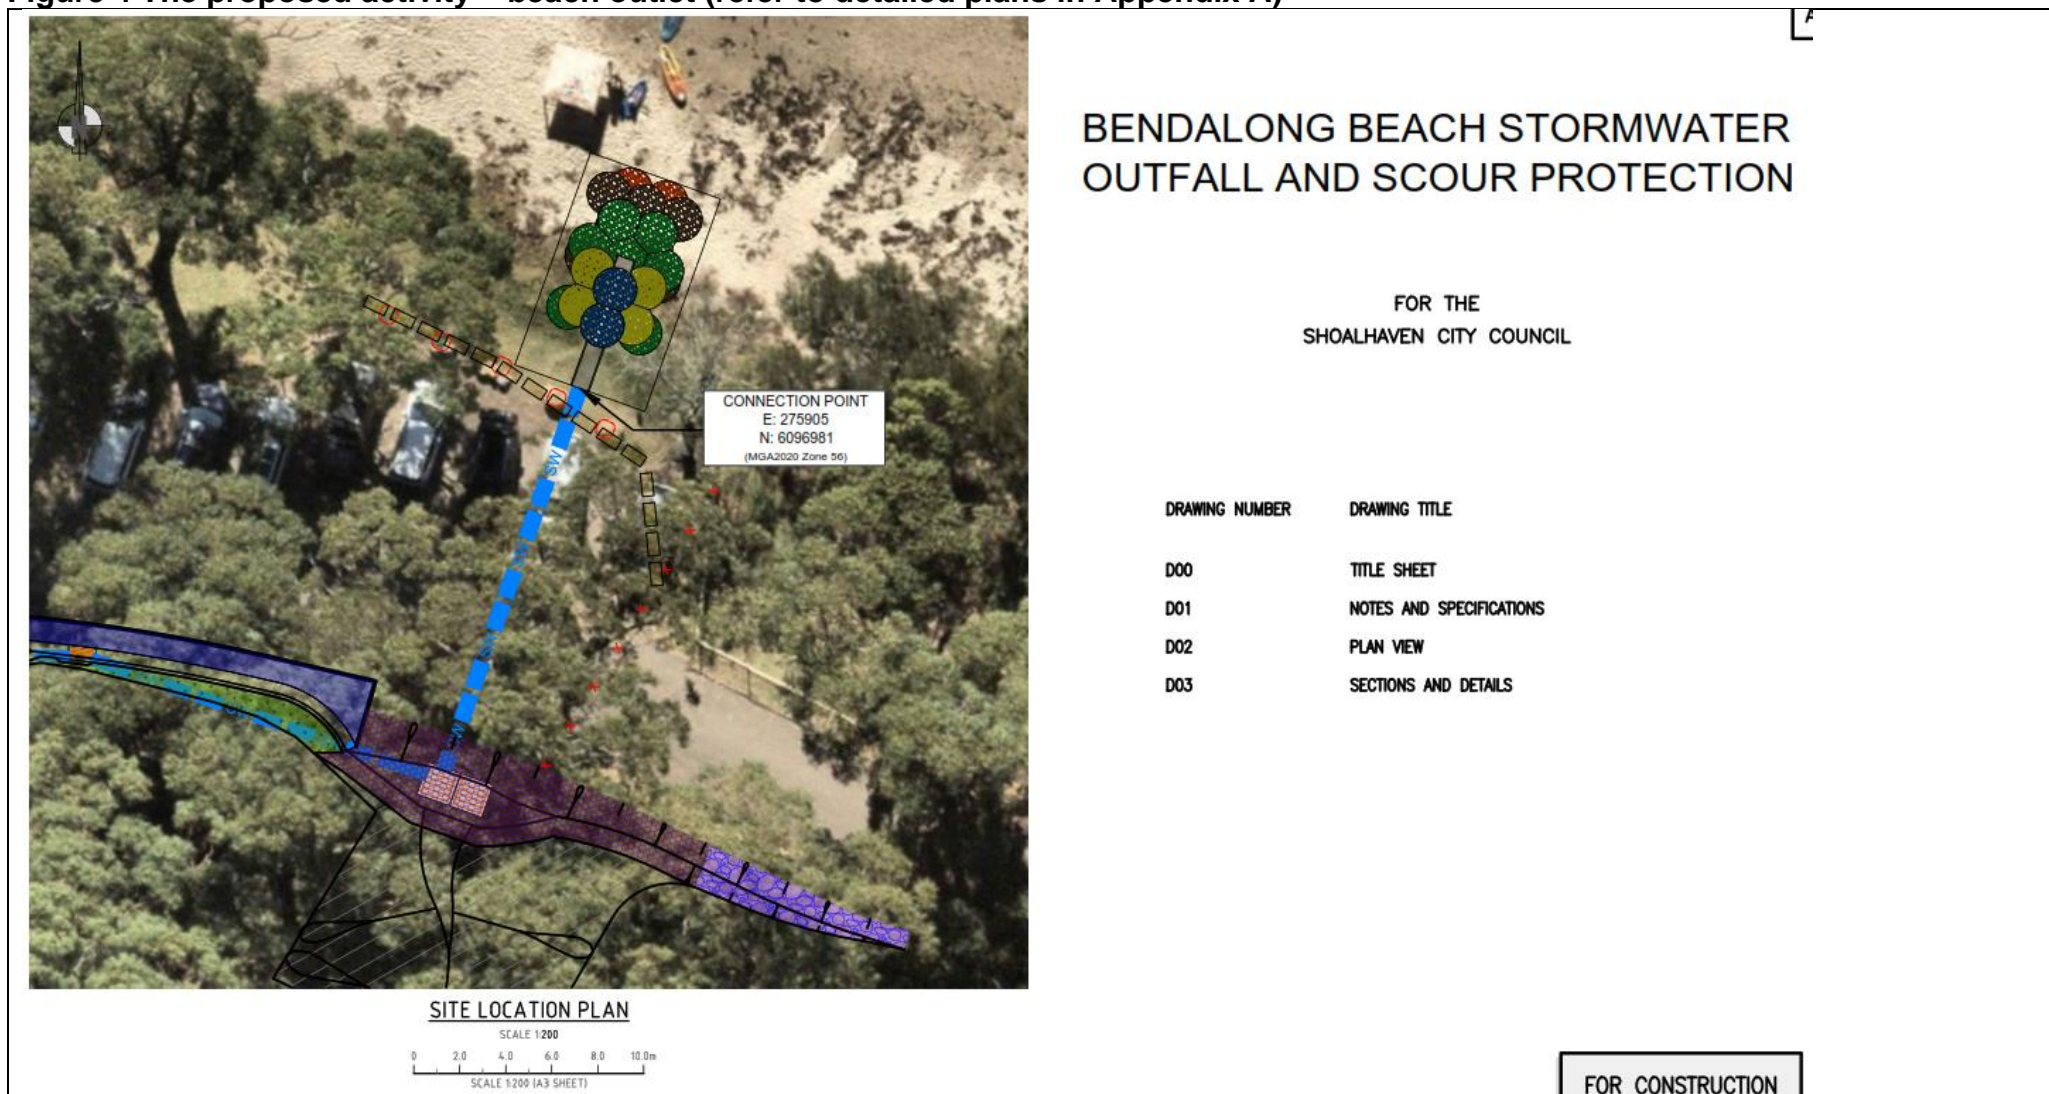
The proposed activity – beach outlet (refer to detailed plans in Appendix A)
